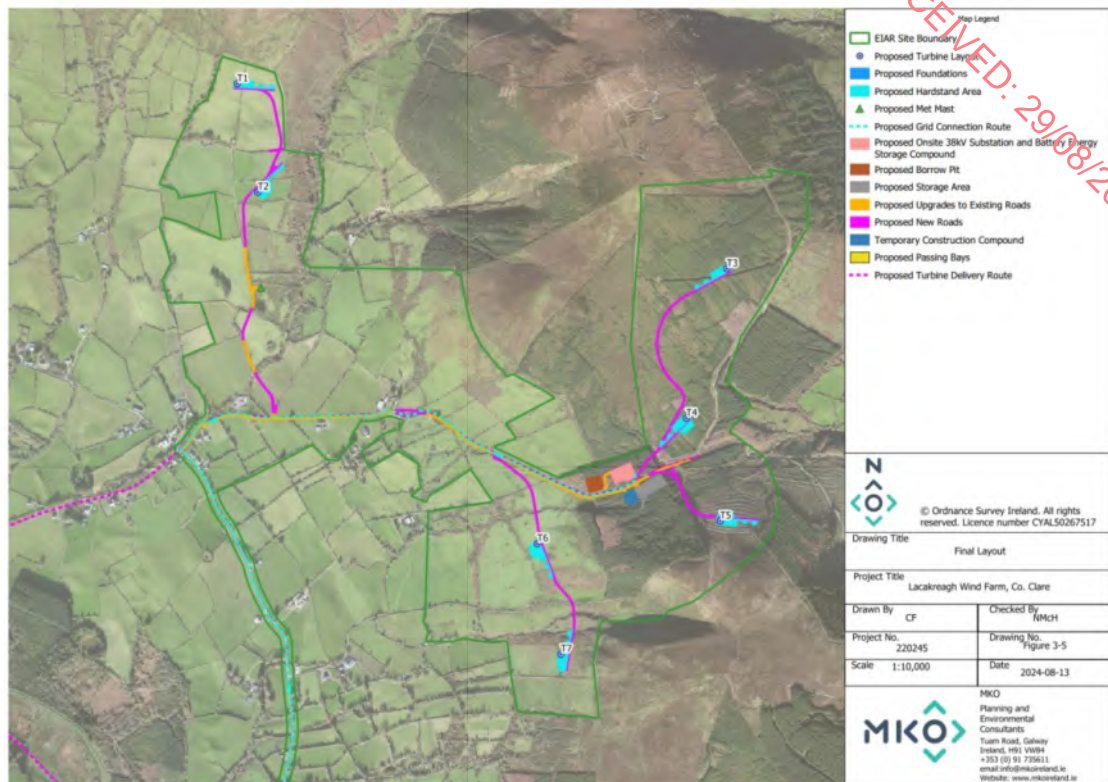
Proposed Layout Iteration No. 4 - Final Proposed Wind Farm Layout
